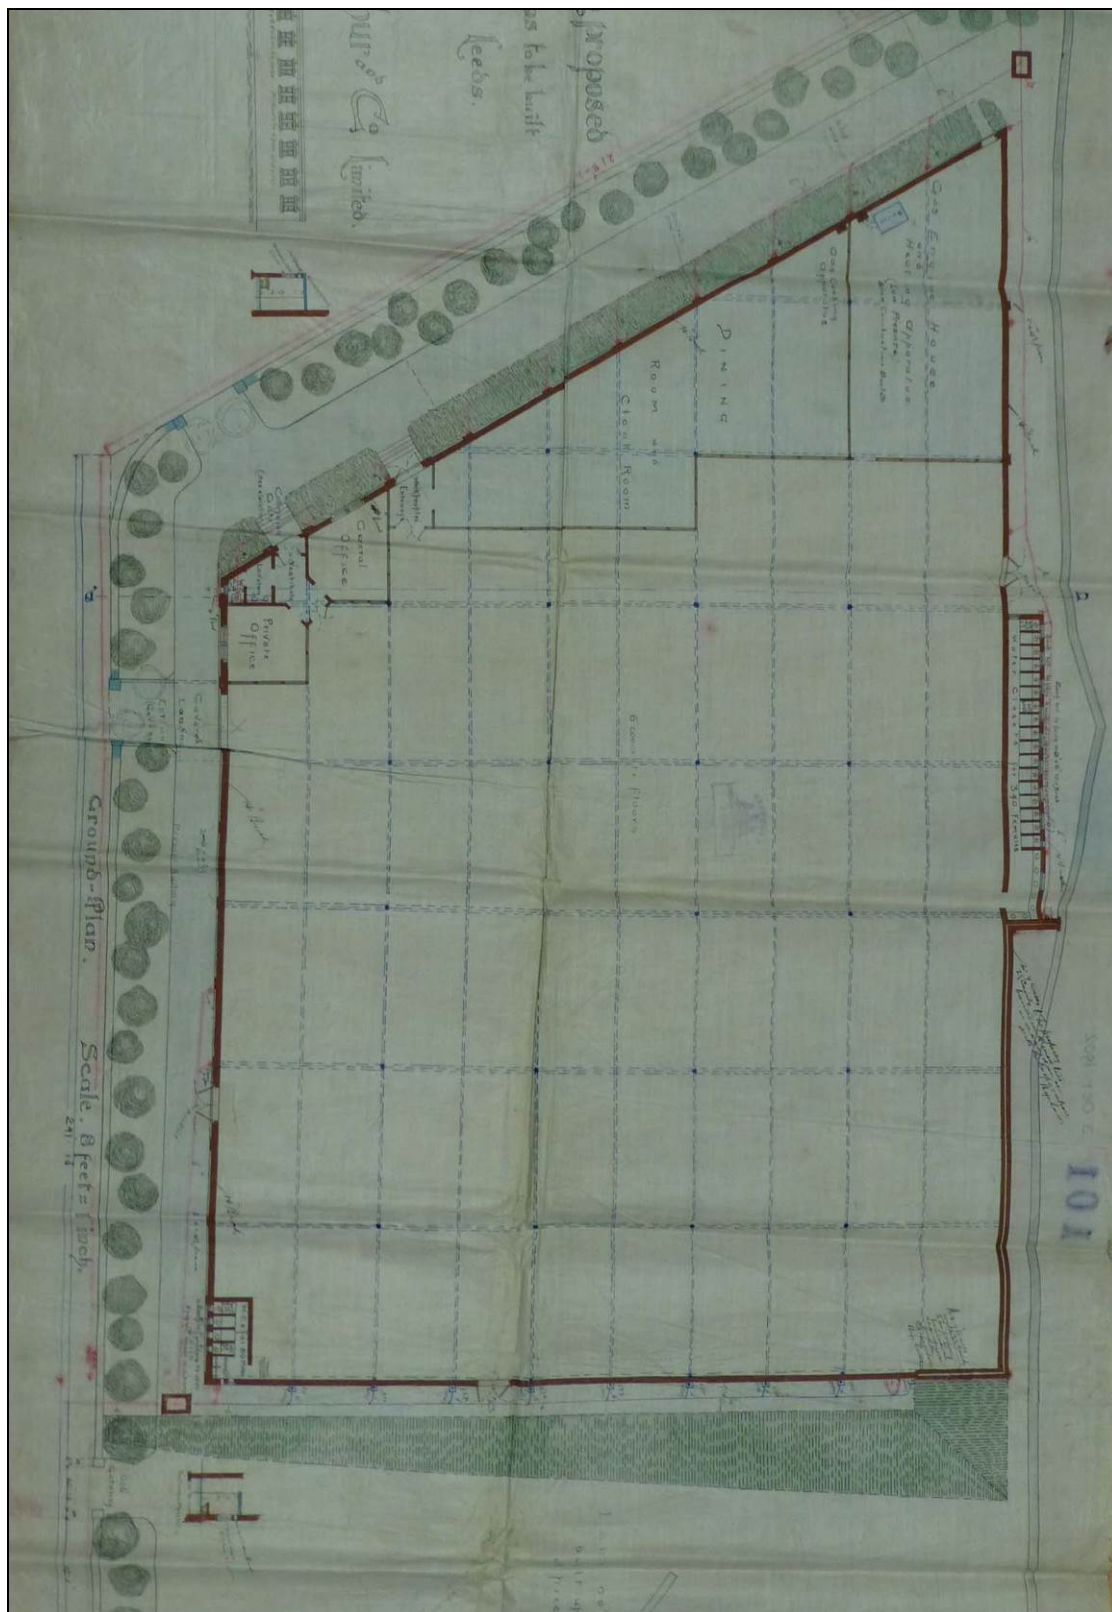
Proposed ground plan for Messrs Arthur and Co. Ltd dated 1902 (Leeds Archives Ref: LC/ENE/BCP no.101)
